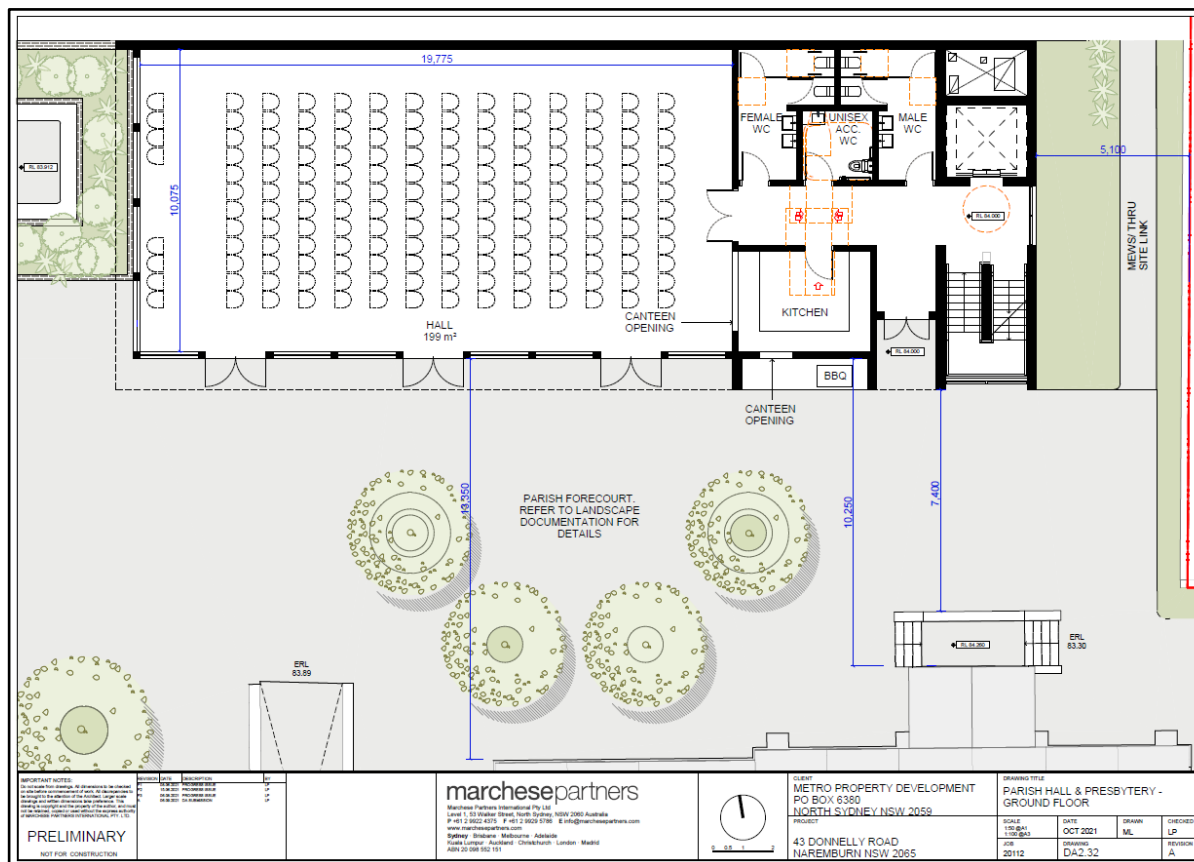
Proposed ground floor plan of the new parish hall and presbytery.
